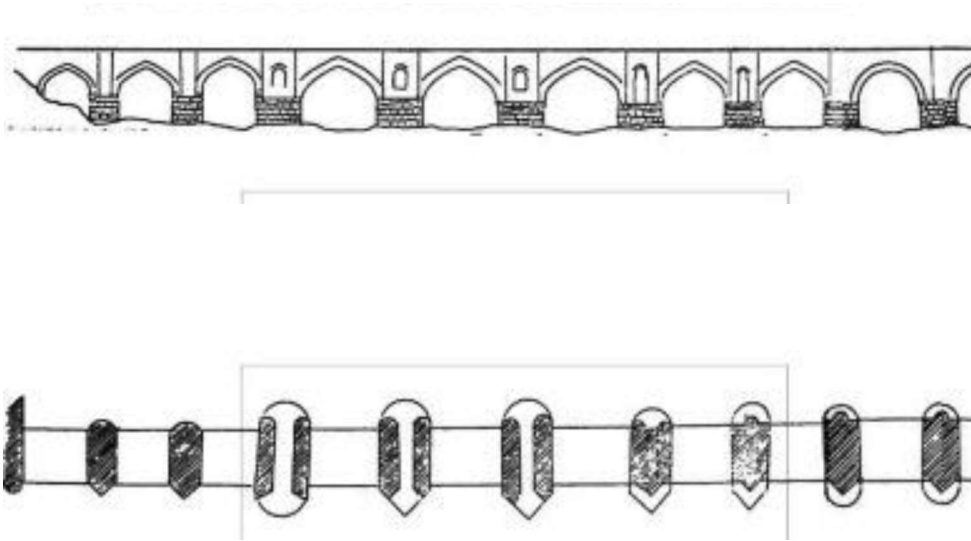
Aji-chay bridge plan and facade, Farshidnik & Afhami, 2010
